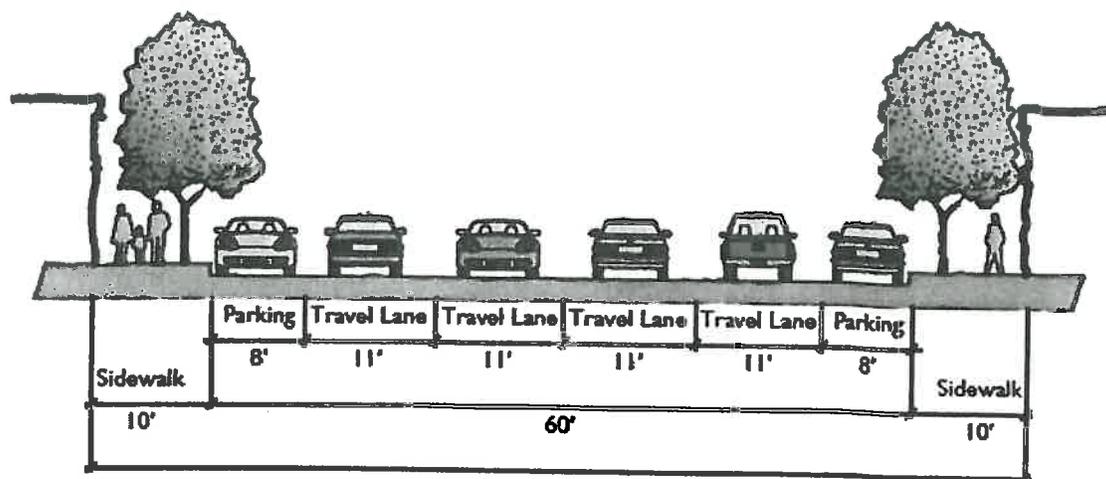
Cross Section for Preferred Streetscape Alternative (1st Street to 6th Street)
